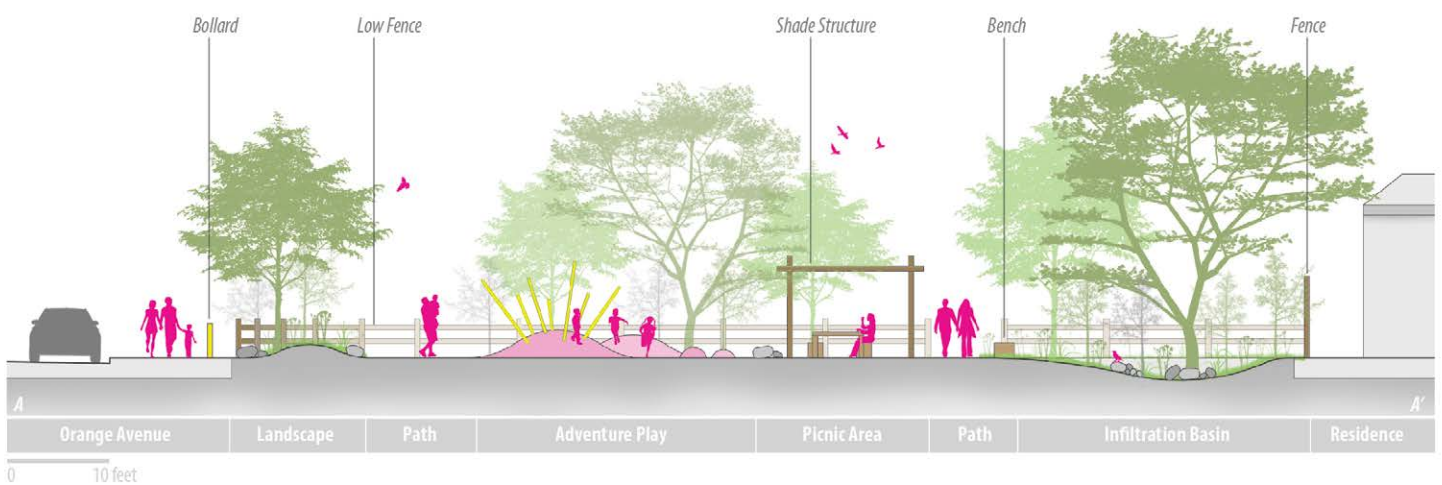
Orange Avenue Vacant Lot – Section Elevation and Site Remediation Strategy
